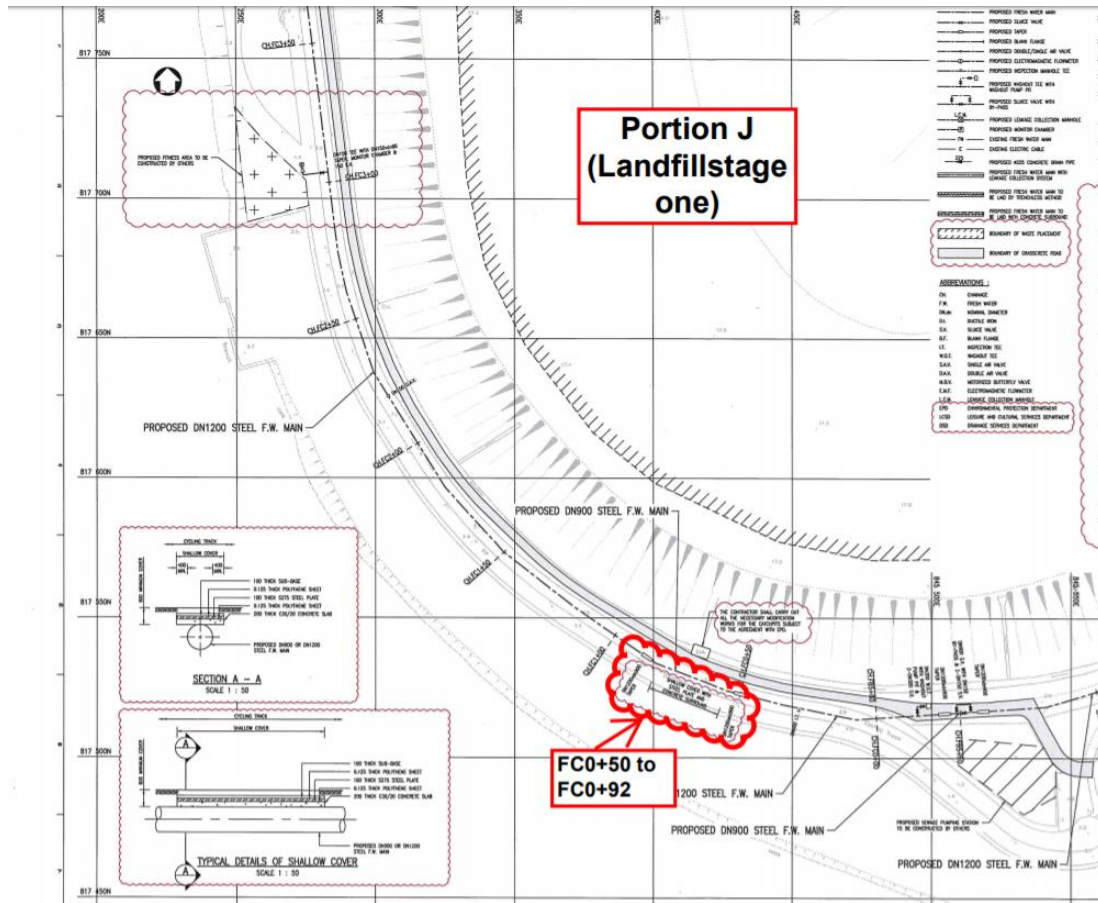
Location Plan – Landfill Stage 1 (Area FC0+50 -FC0+92)
